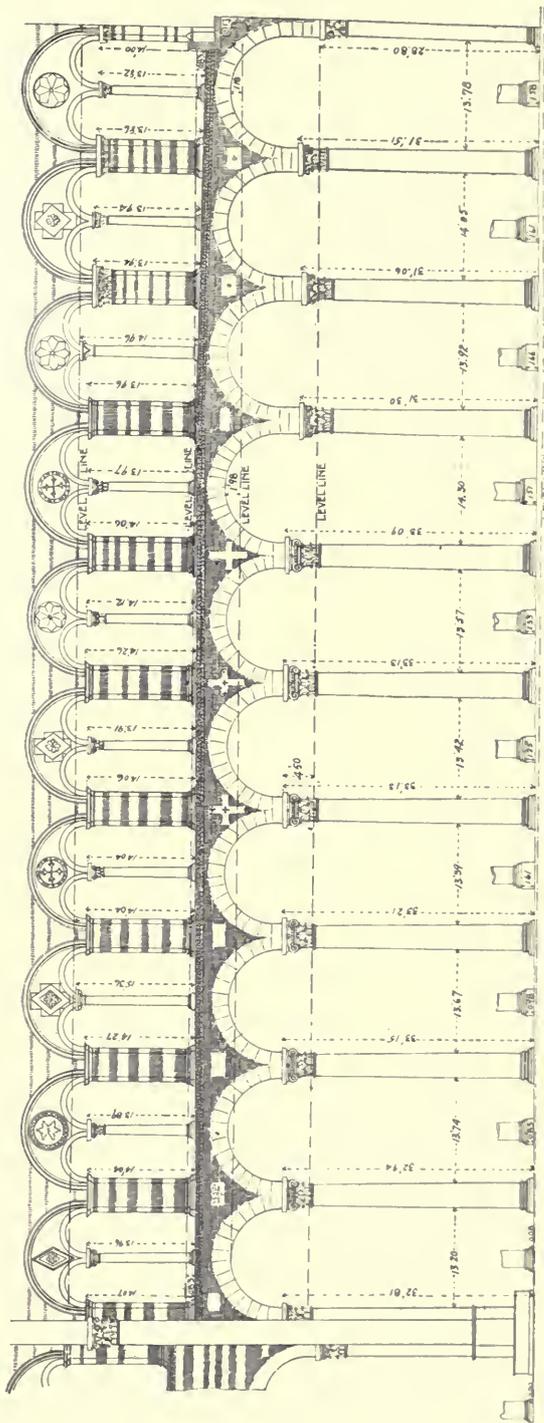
PISA CATHEDRAL. SURVEY OF THE SOUTH GALLERY BEND IN ELEVATION.
